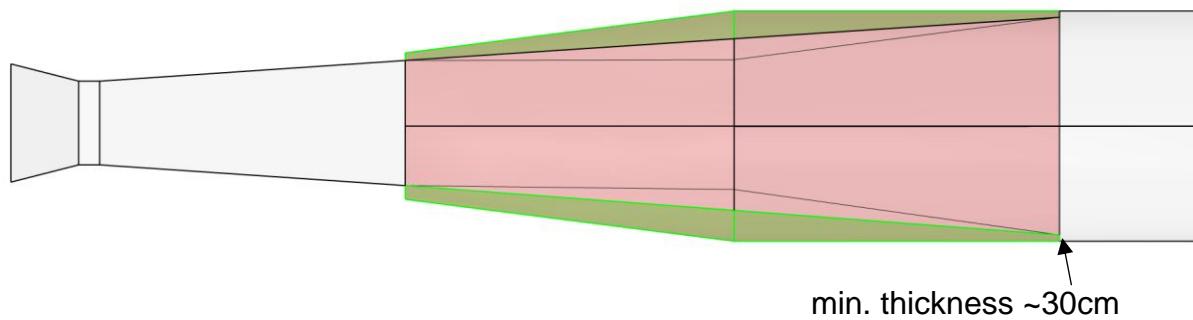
Side walls as diffuser extension in addition to bottom ramp, plan view
